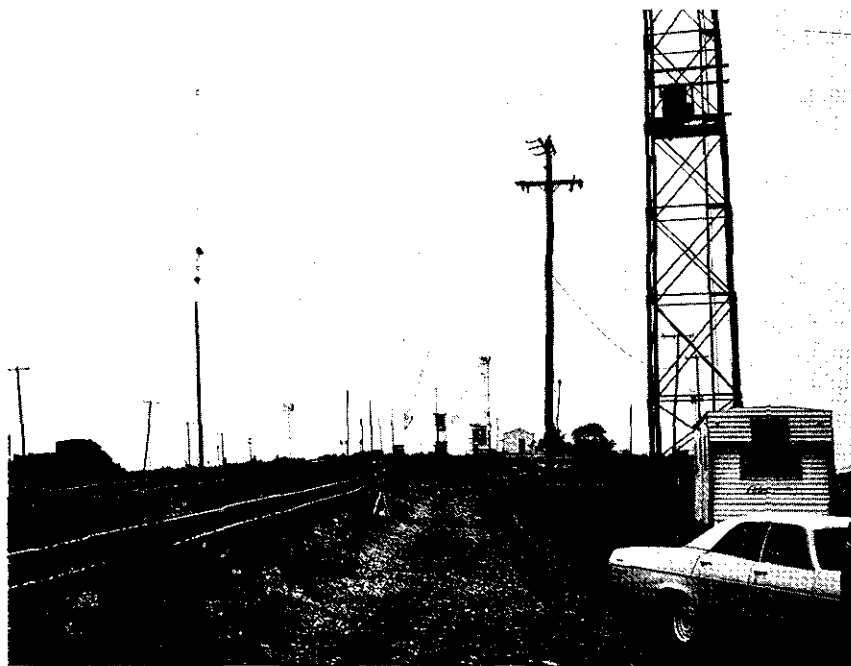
VIEW OF THE INSPECTION SYSTEM
